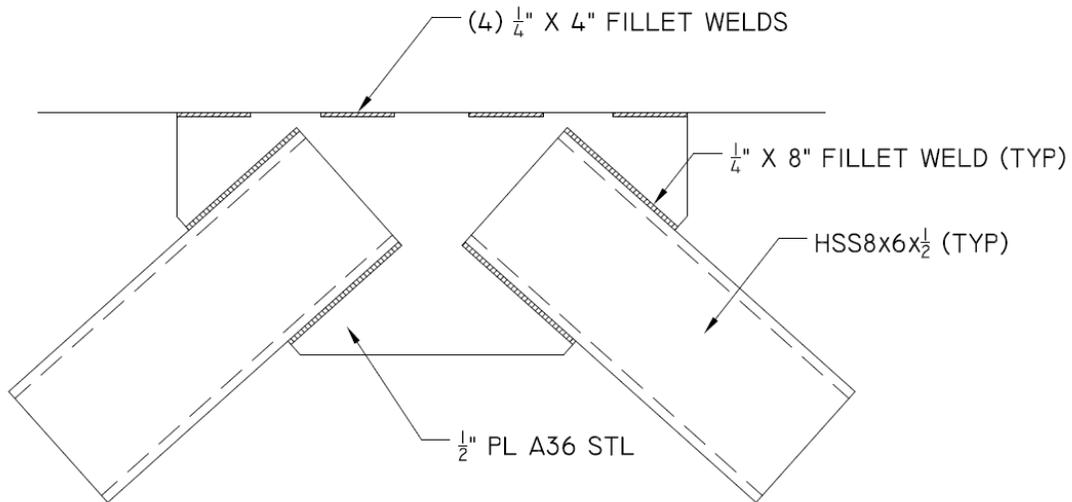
Typical Proposed Mid-span Connection for Chevron Braces
